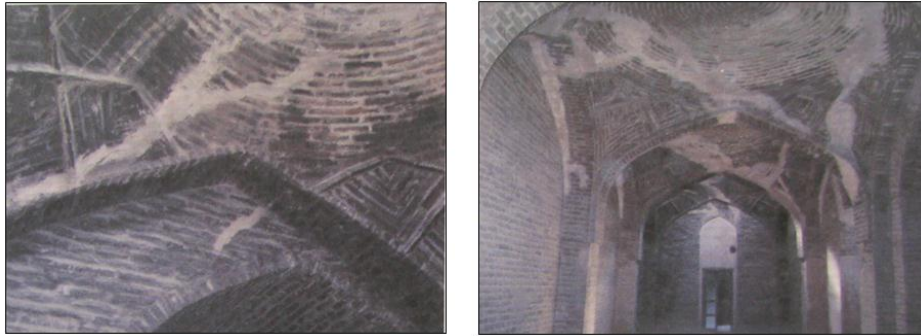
and 2 Cracks on the corridor of the second floor (Isfahan's Archives of Cultural Heritage)
